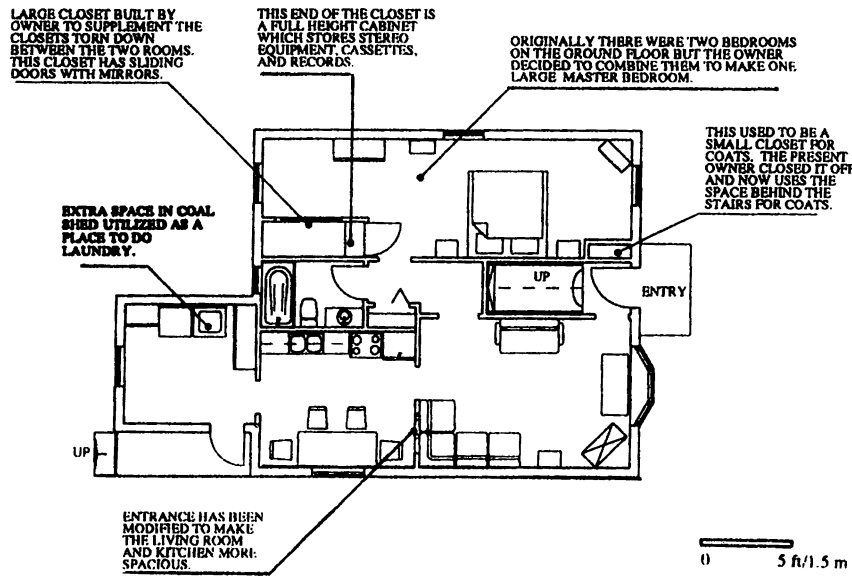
Ground-floor plan of case study 1: expanded master bedroom.
